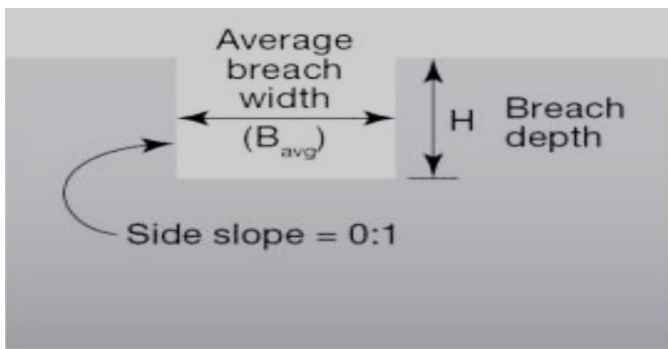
Breach mechanism of a concrete dam from FEMA Guidelines[5]
